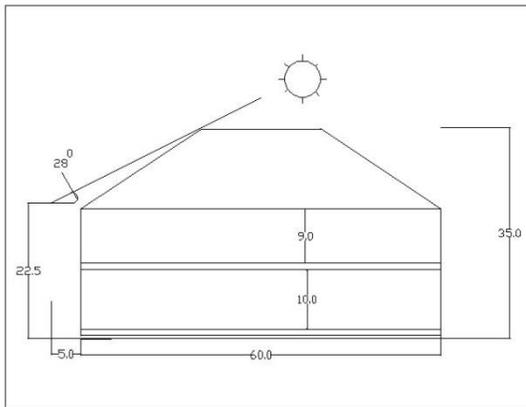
TWO-STORY HIP ROOF MEETING SOLAR ACCESS STANDARDS
